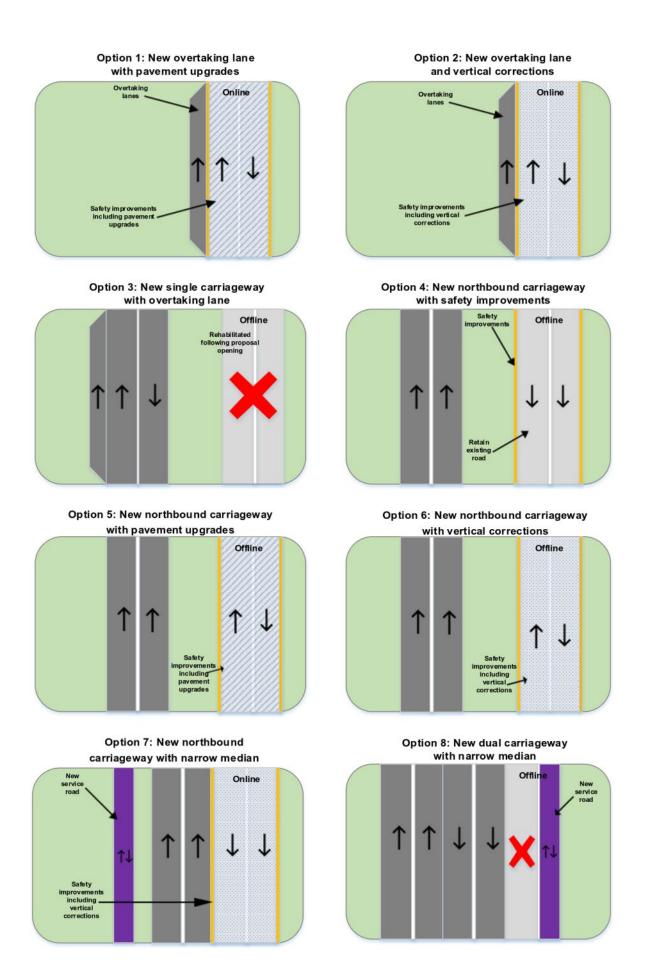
Schematic diagrams showing the layouts of the initial design options
